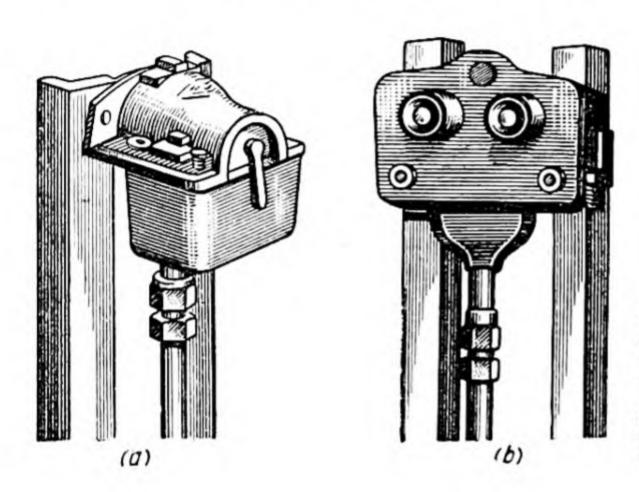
Conduit piping connected to starting apparatus and a control de-
